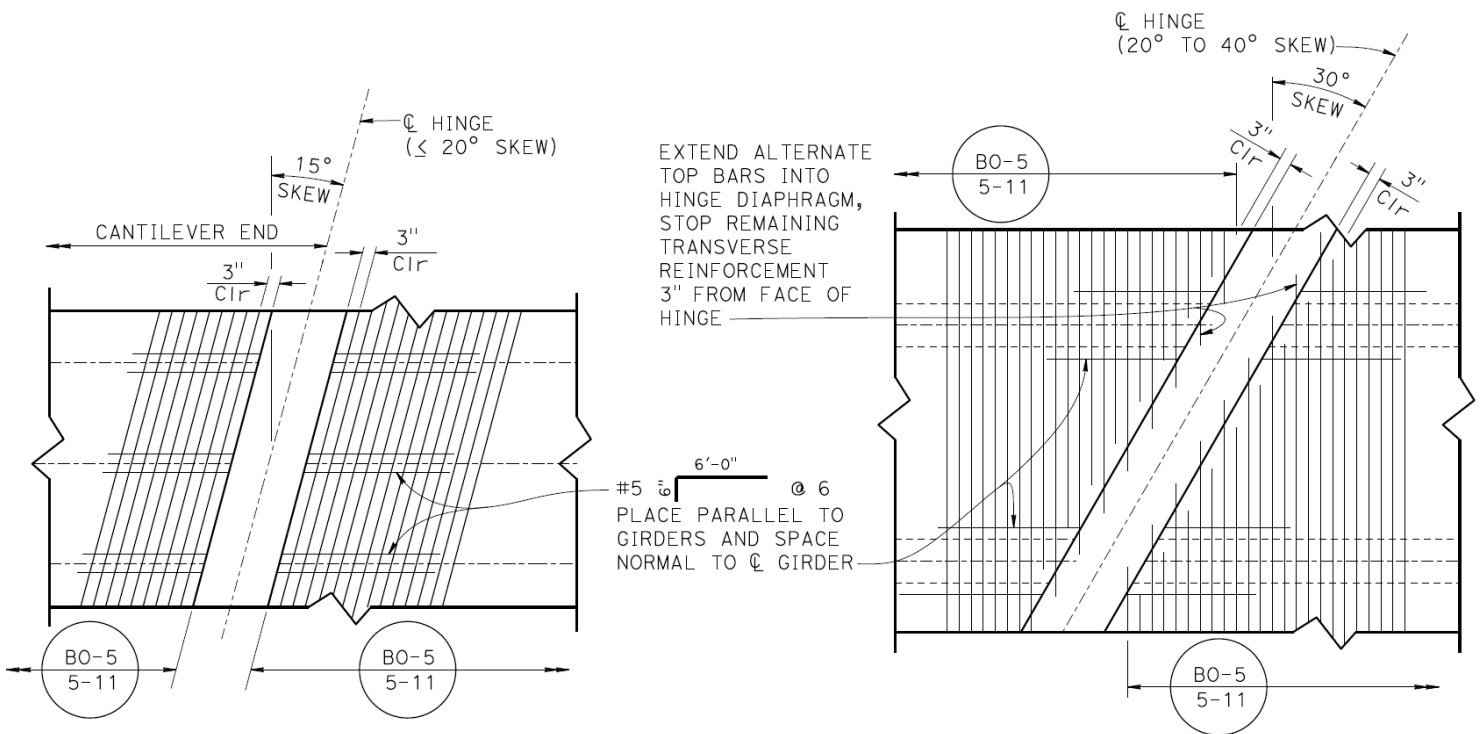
Transverse Deck Reinforcement Details at Hinge ($\leq 40^\circ$ Skew)
